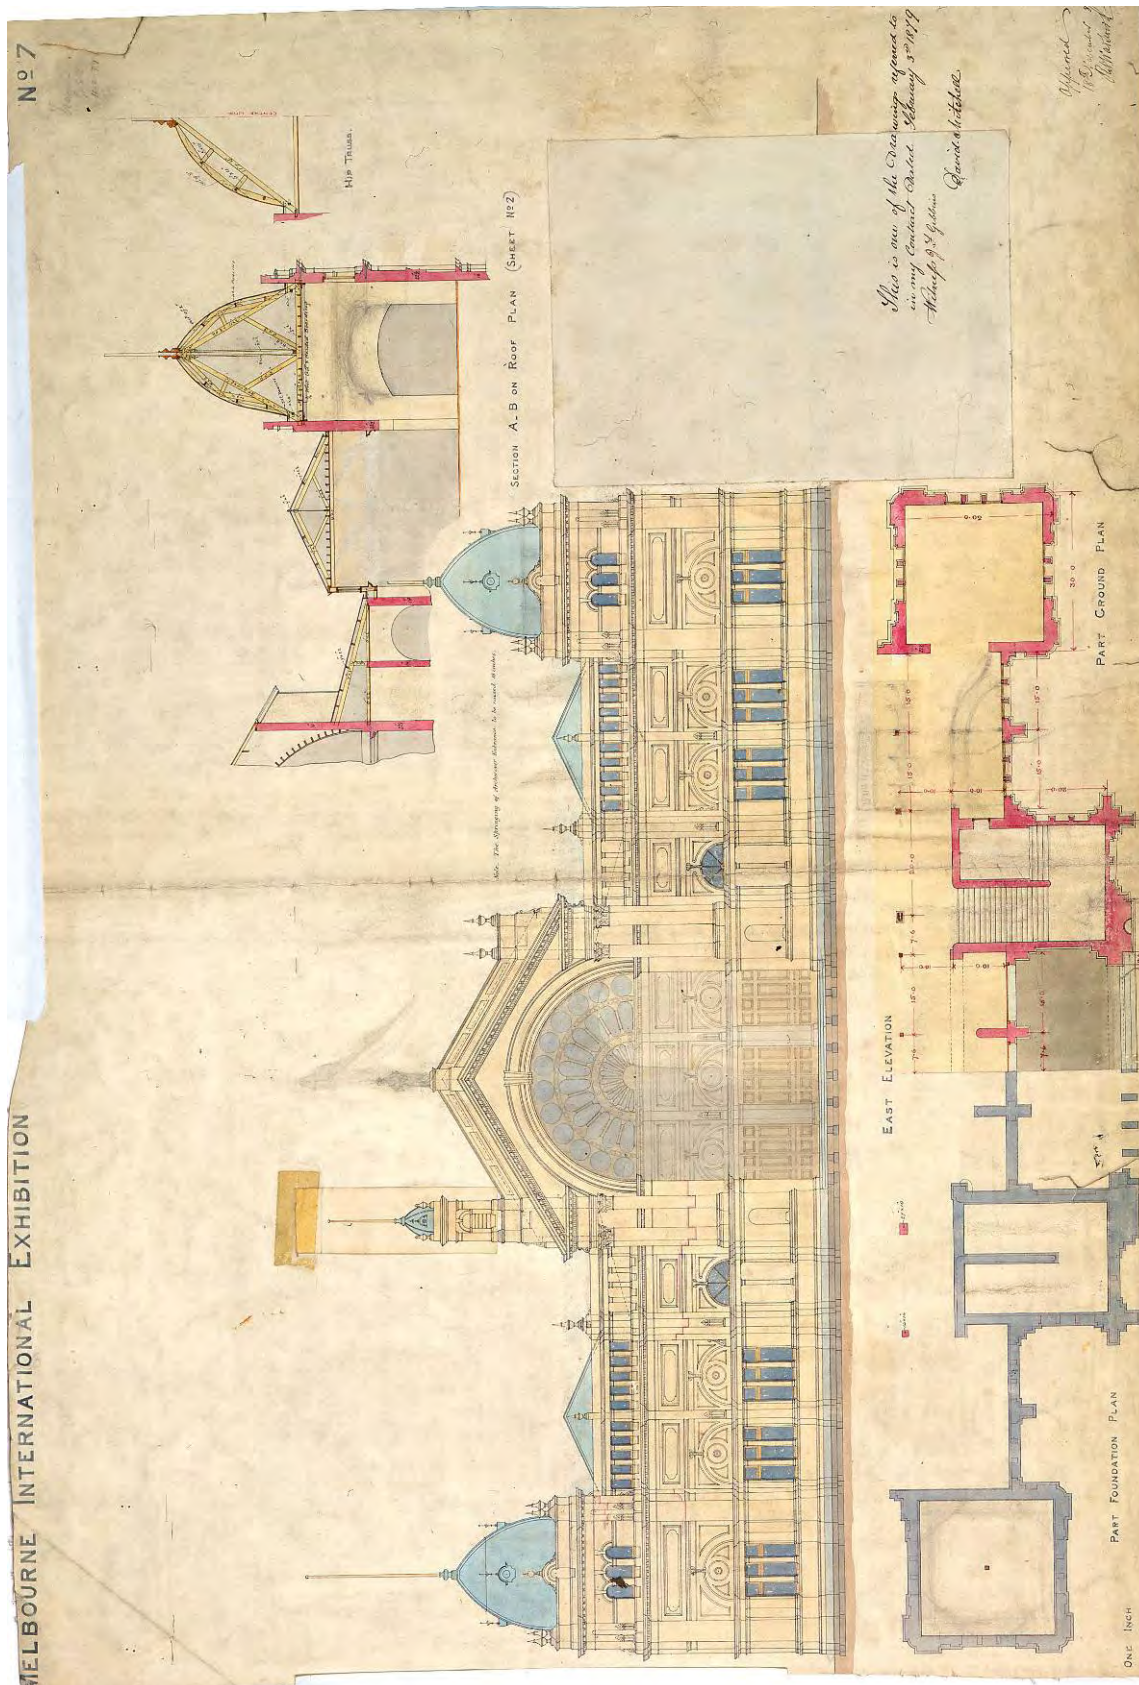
The Melbourne International Exhibition, east elevation, part foundation, part ground plan, & section A—B roof plan, 1879.
